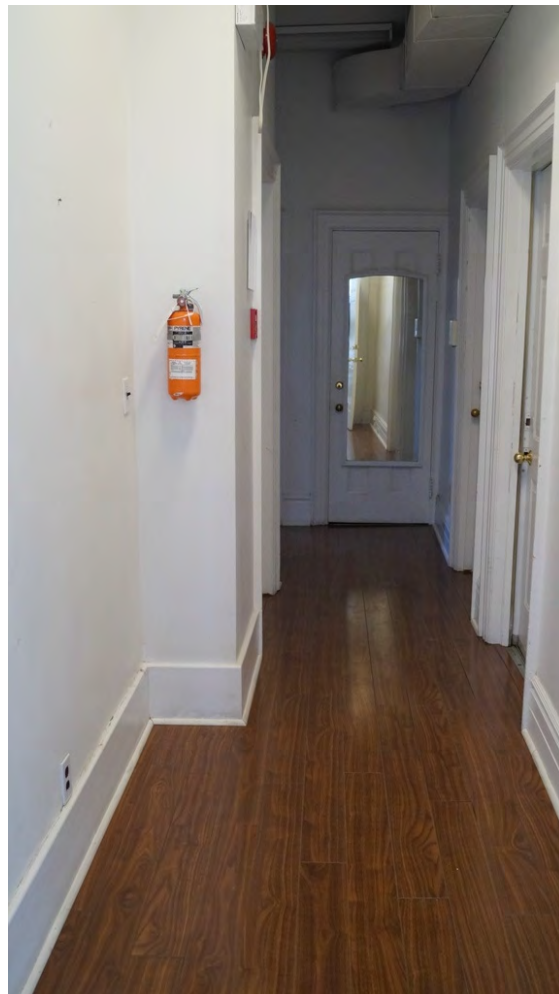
North-south hall on ground floor as viewed from parlour. The narrow hall likely results from an alteration to the original plan.
